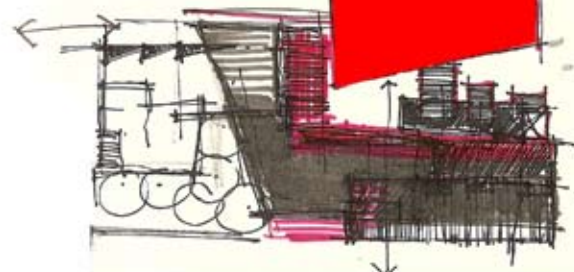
Roof articulation as a collection of smaller separated roofs
